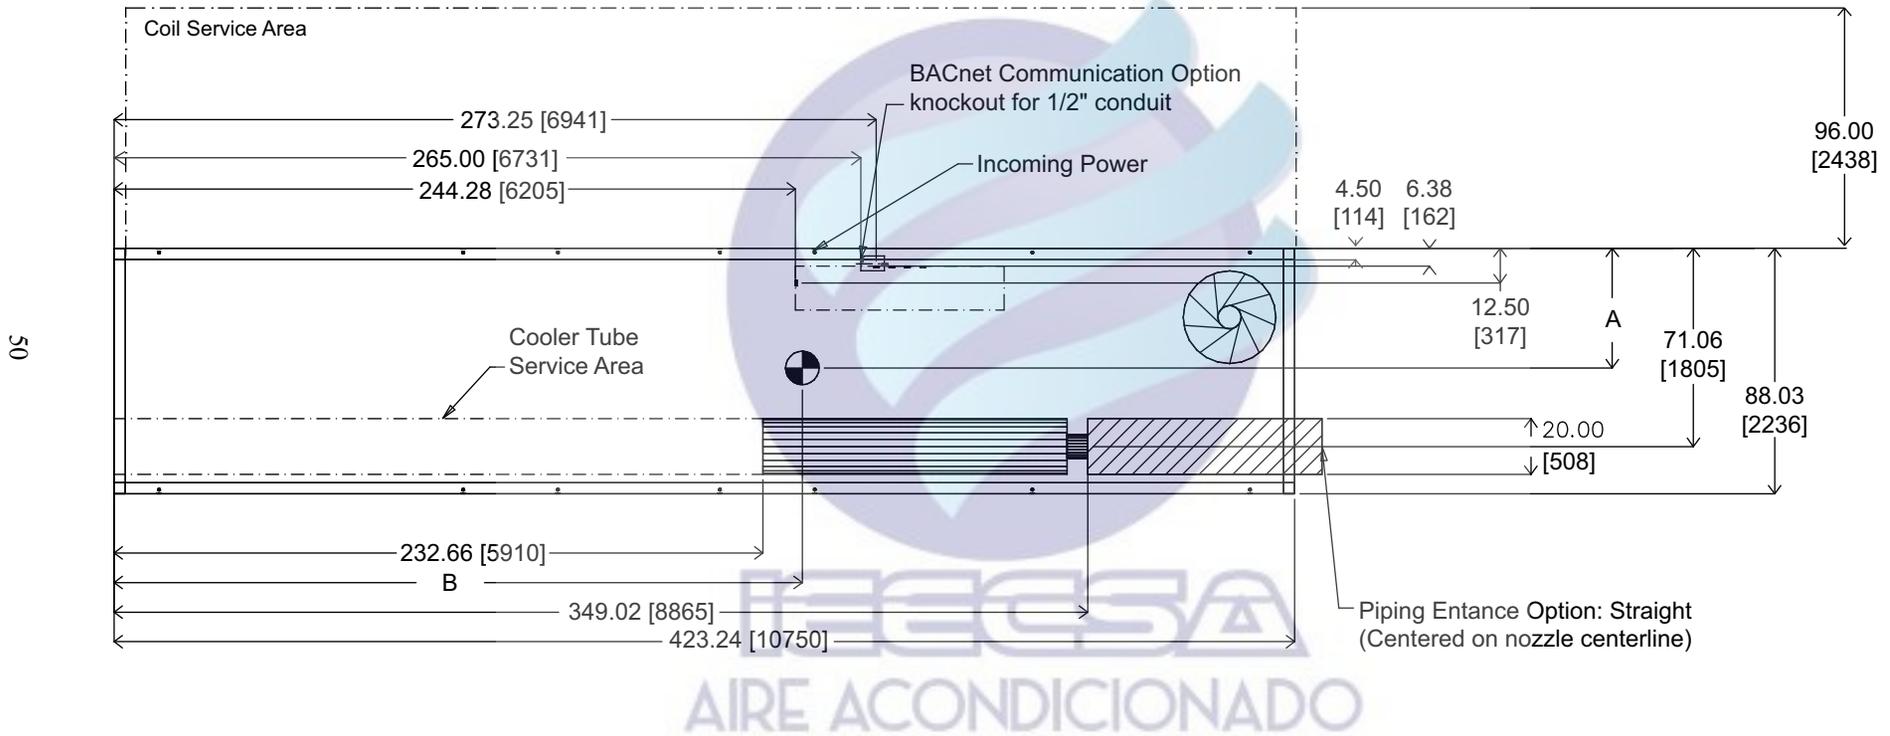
30XA302 Air-Cooled Liquid Chiller Dimensions (cont)
